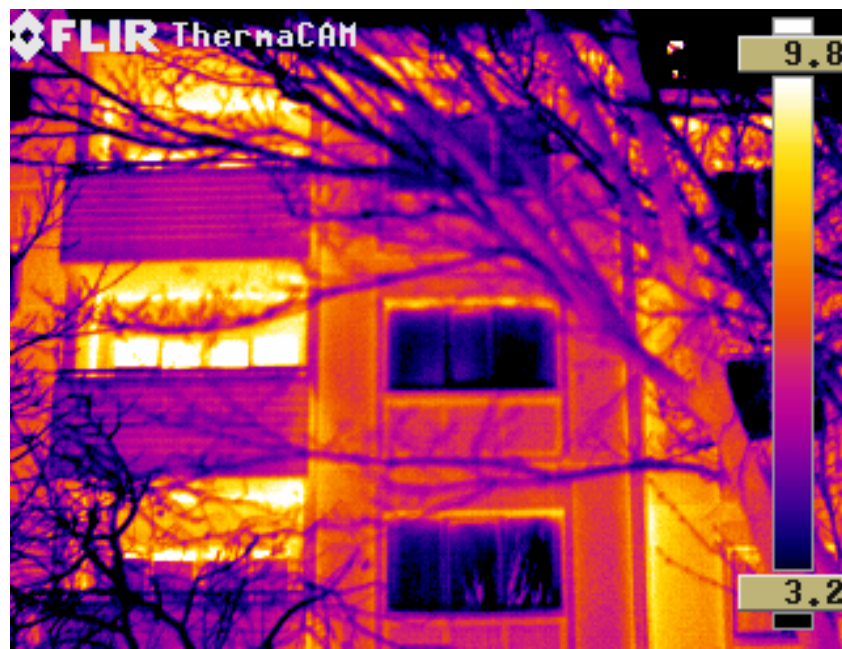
Thermal image: northwest façade of the apartment block (16.03.2008)
